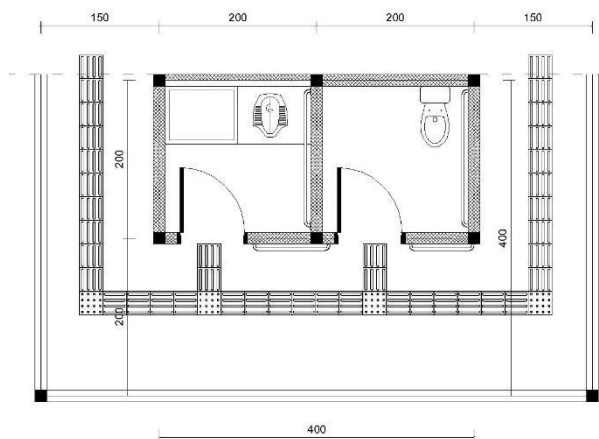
Toilet Floorplan of Surakarta State Special School (Source: Surakarta State Special School's Document, 2025)
